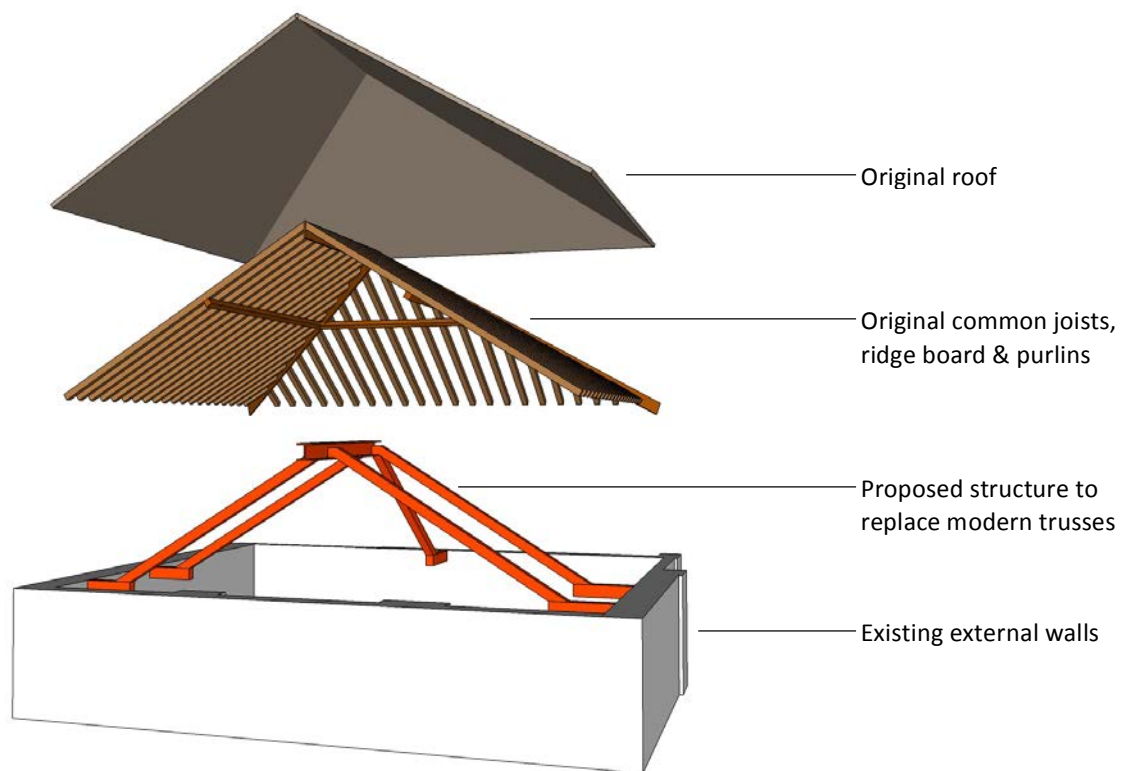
An exploded schematic model of the proposed steel structure to support the existing roof.
